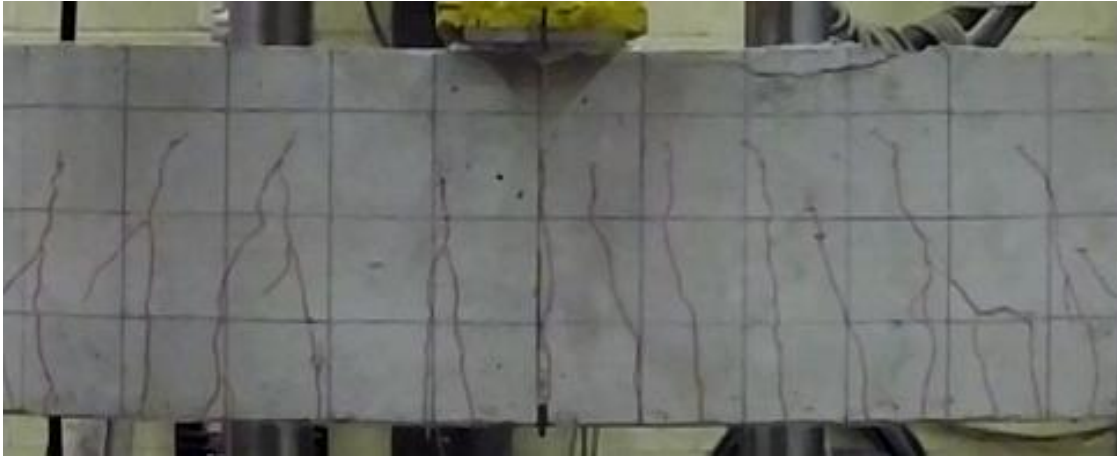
BM 10.5-150: Crack patterns at failure
